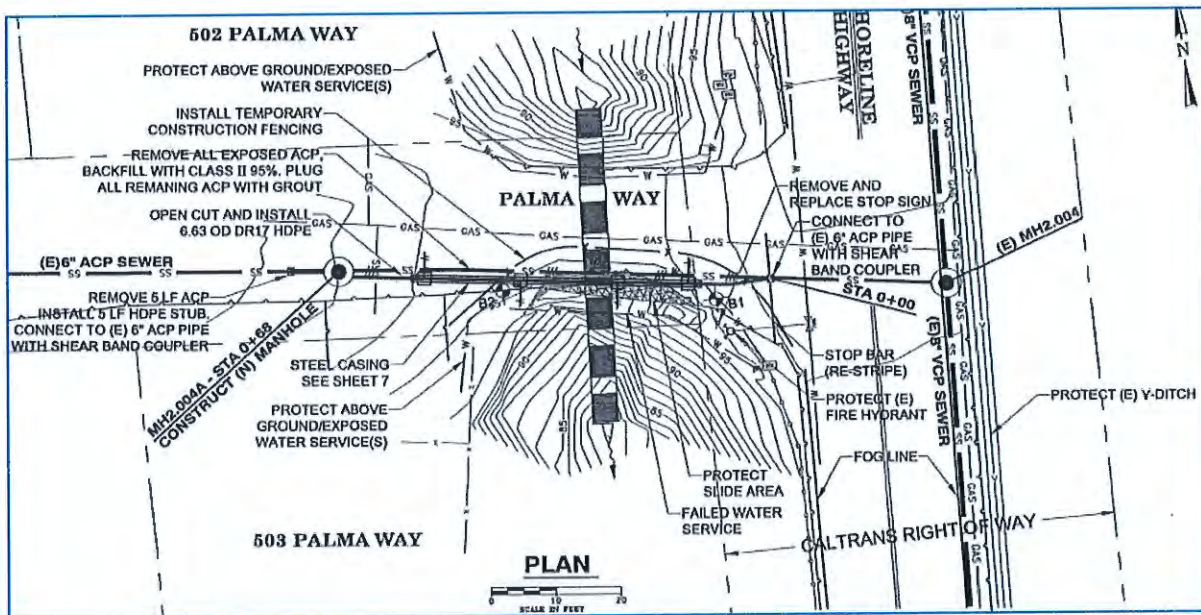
August 2015 Plan for TCSD Sewer Replacement with steel casing and drilled pier footings in the roadway to repair sag and deformed sewer main pipe. The repair extended from Station 0+00 at the edge of the Caltrans Roadway/Stop Bar of Palma Way to Station 0+68 where a new manhole was installed. The old pipe was plugged and abandoned.
